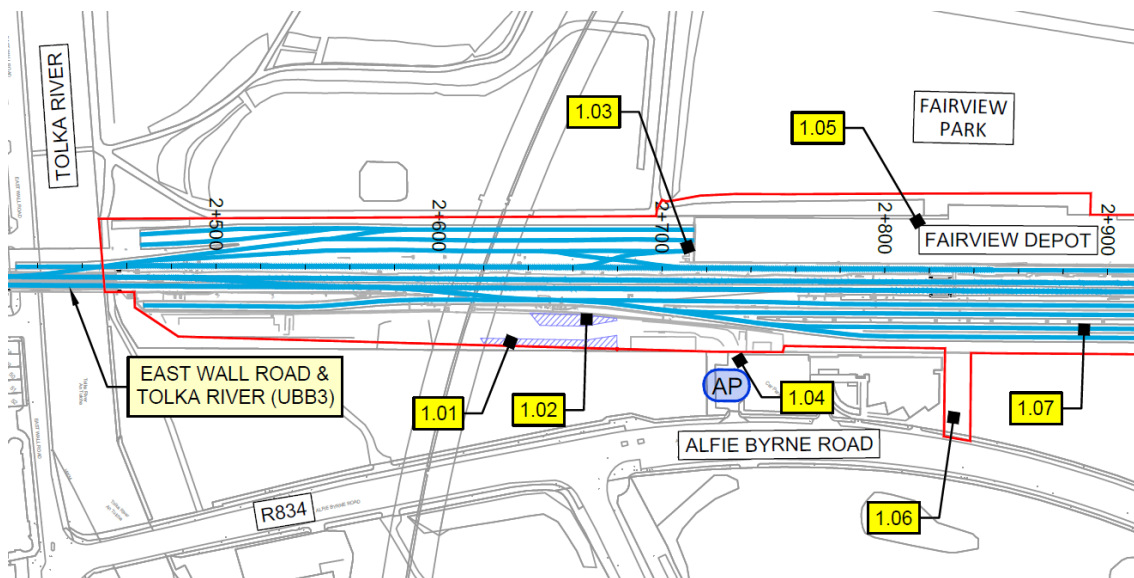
Excerpt from Railway Order Application Work Plan 01
